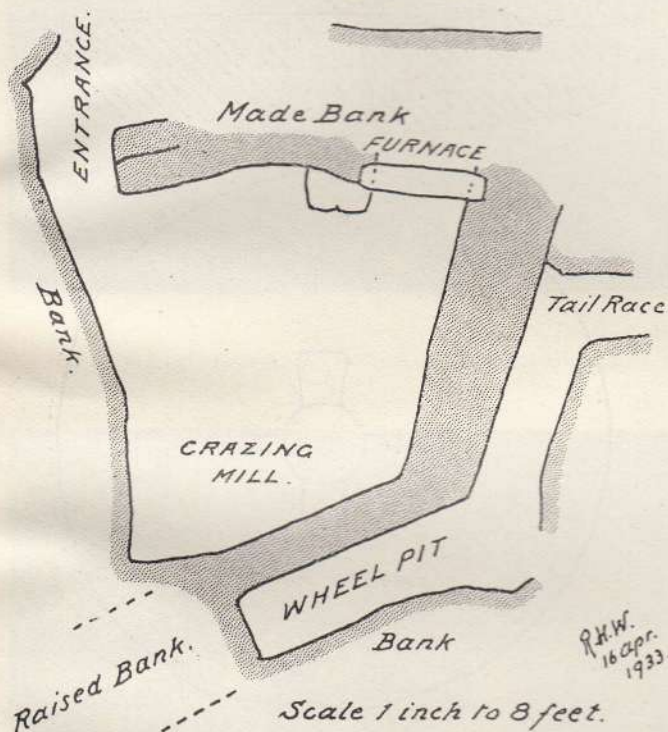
PLAN OF OUTCOMBE BLOWING HOUSE
